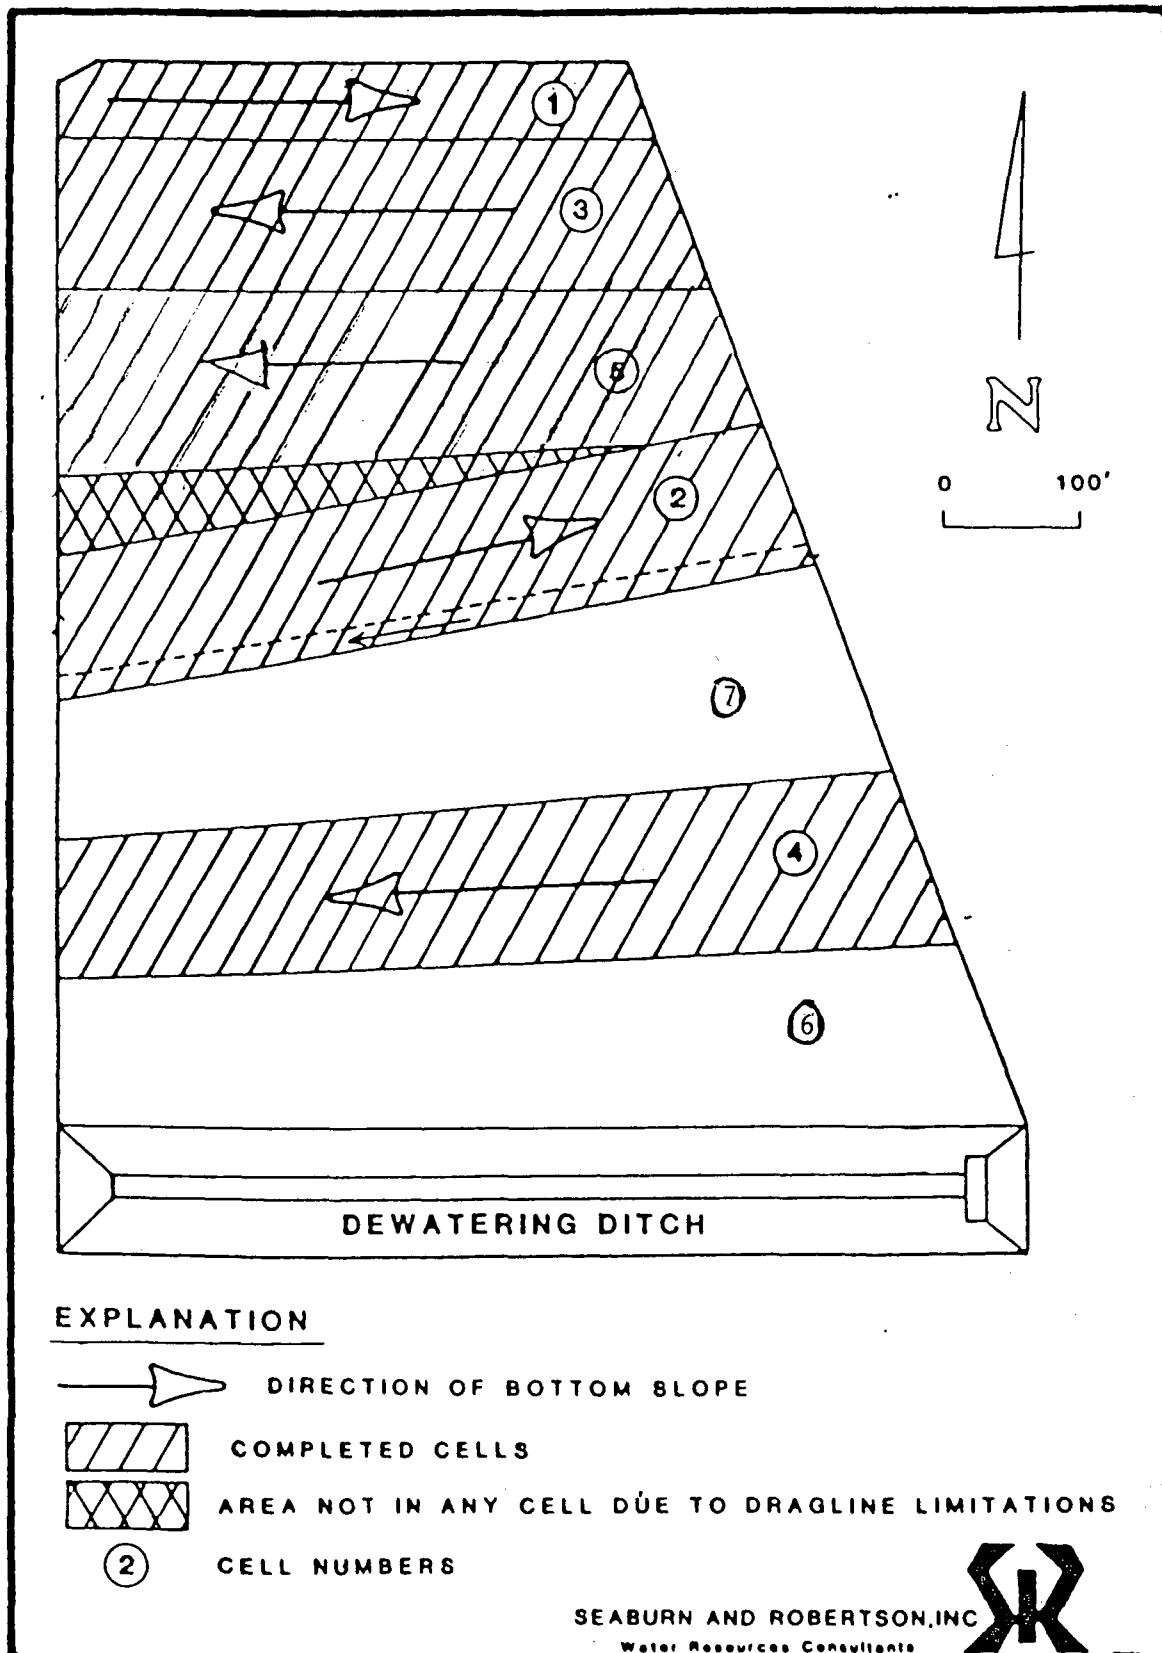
SITE PLAN FOR HARDEE COUNTY LANDFILL - PHASE 1
